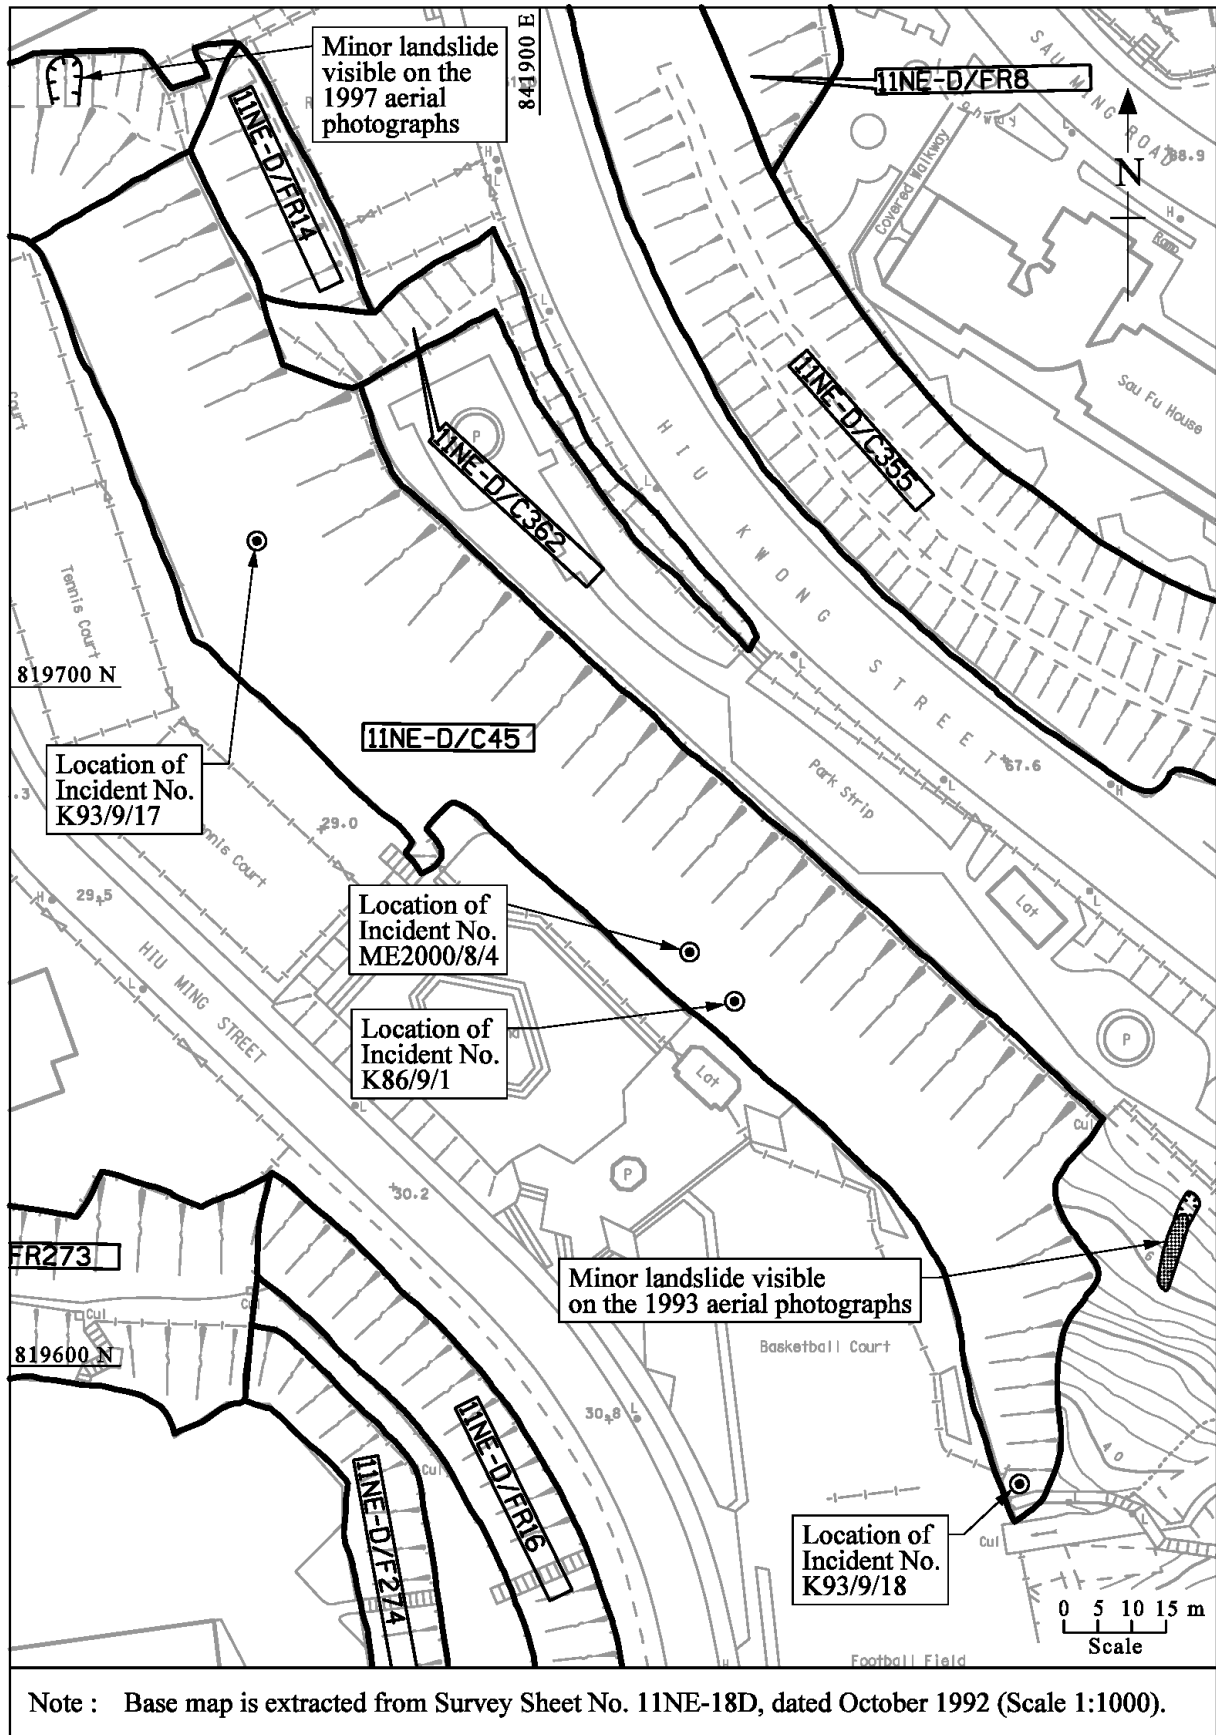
Location Plan Showing Locations of Previous Instabilities
